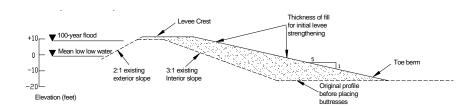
Delta Wetlands Proposed Embankment Cross Sections
